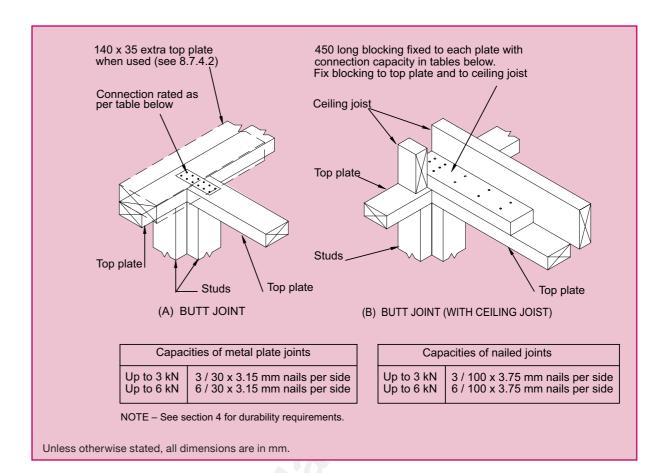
Connecting top plates to external walls at right angles - Walls containing bracing (see 8.7.3.4)
